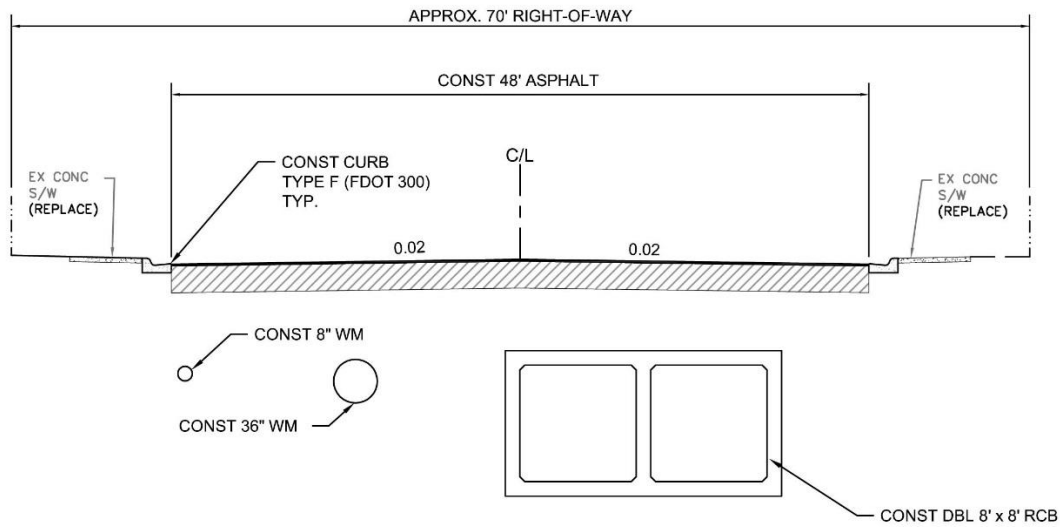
Cass Street East of Willow Avenue Typical Section (NTS)
